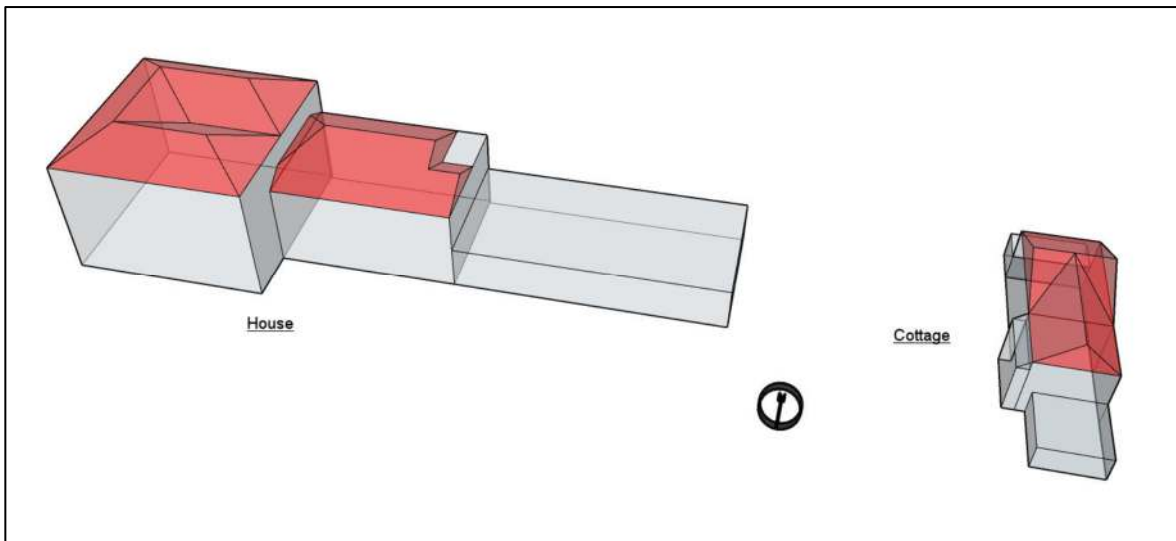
Rough plan of the buildings showing the extent of the enclosed roof voids (shaded pink)
